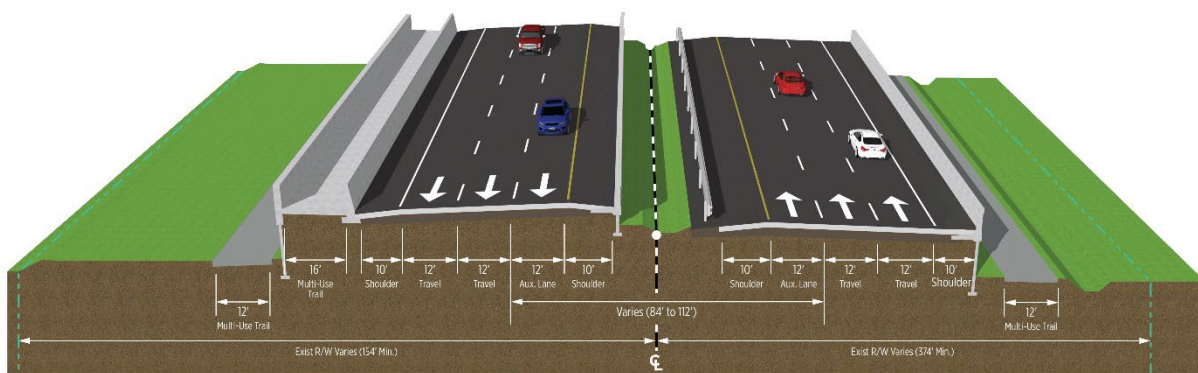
Segment 2 – Typical Section 4 Bridges Over Old Tampa Bay
